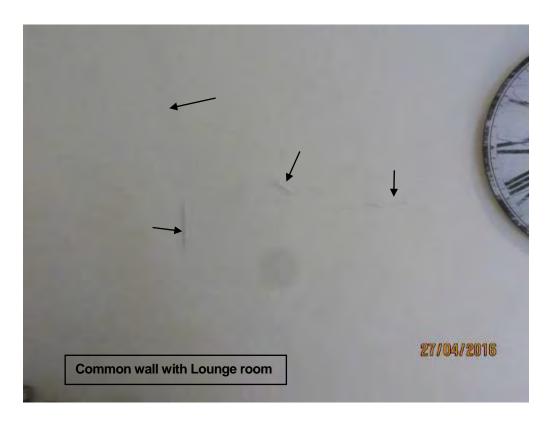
shows hairline cracks and lifting paint to the wall at the northwest corner of the Dining room
